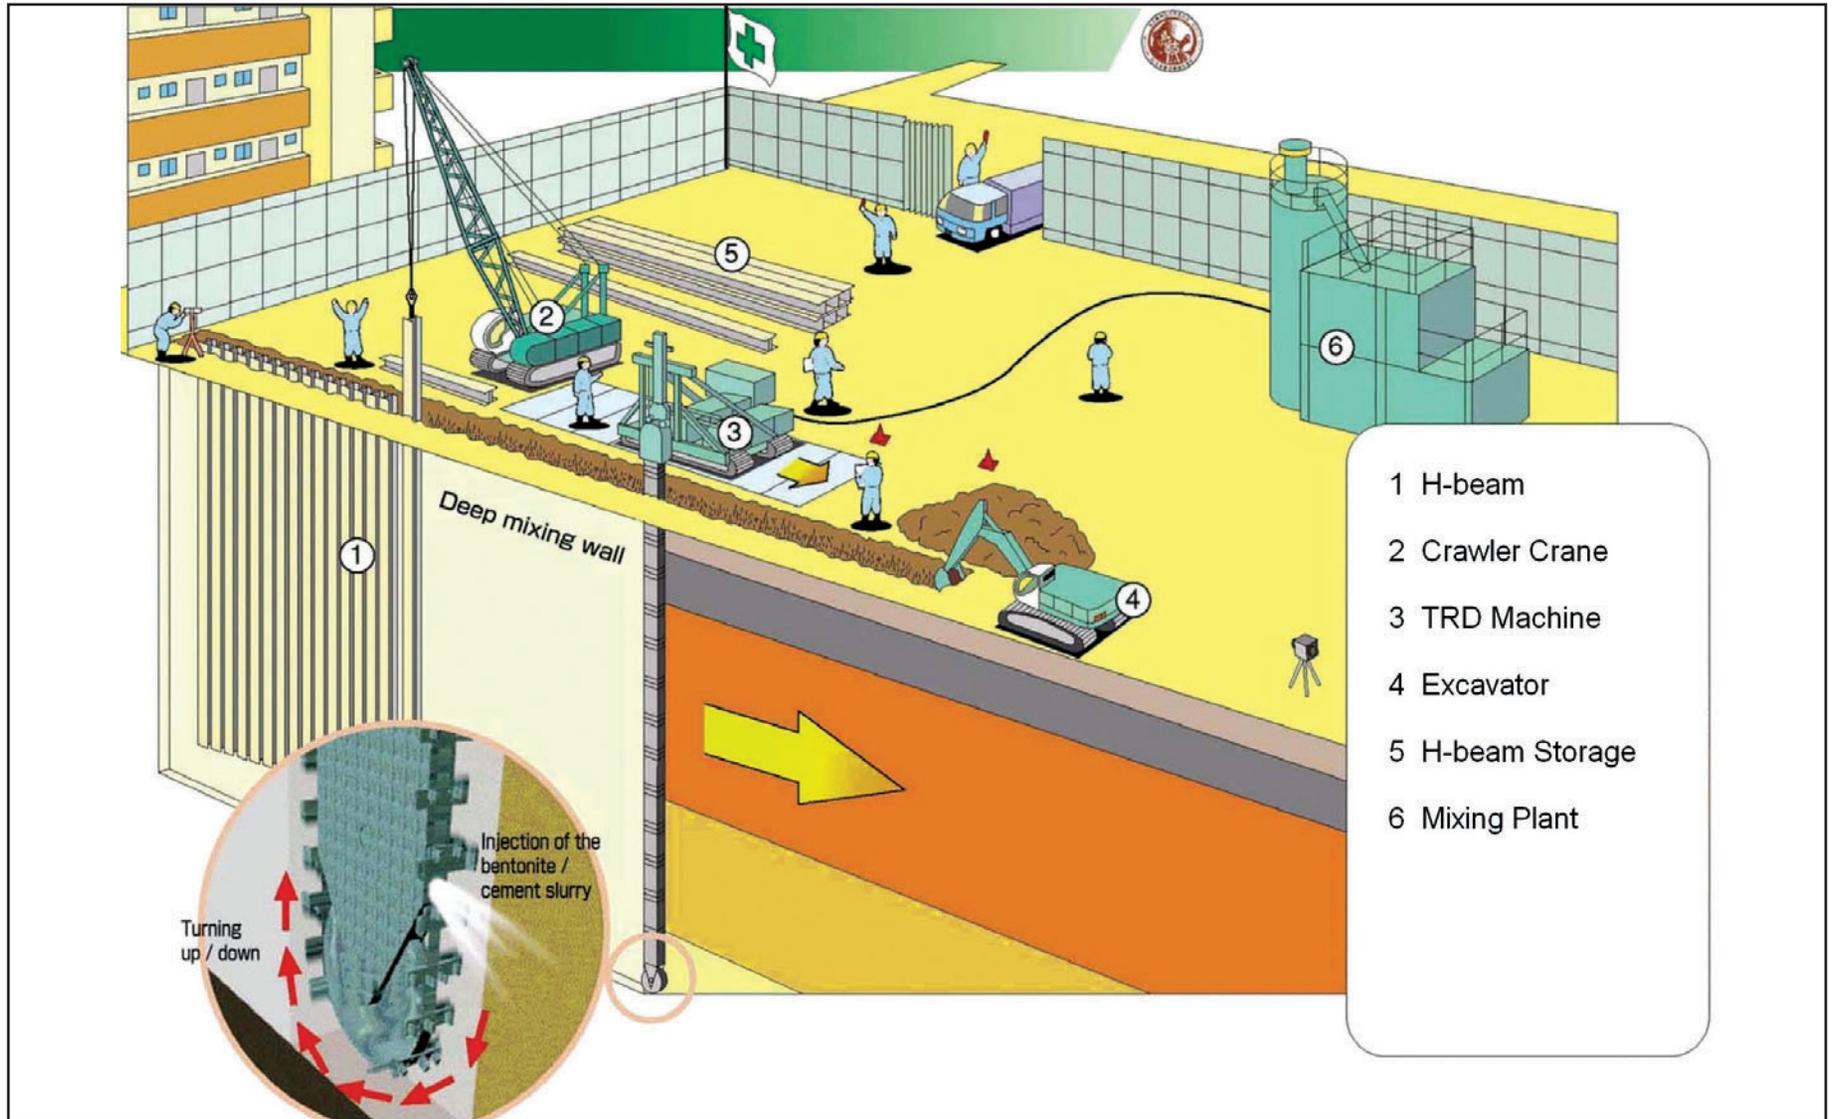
Trench Remixing and Deep-Wall Method (TRD)
